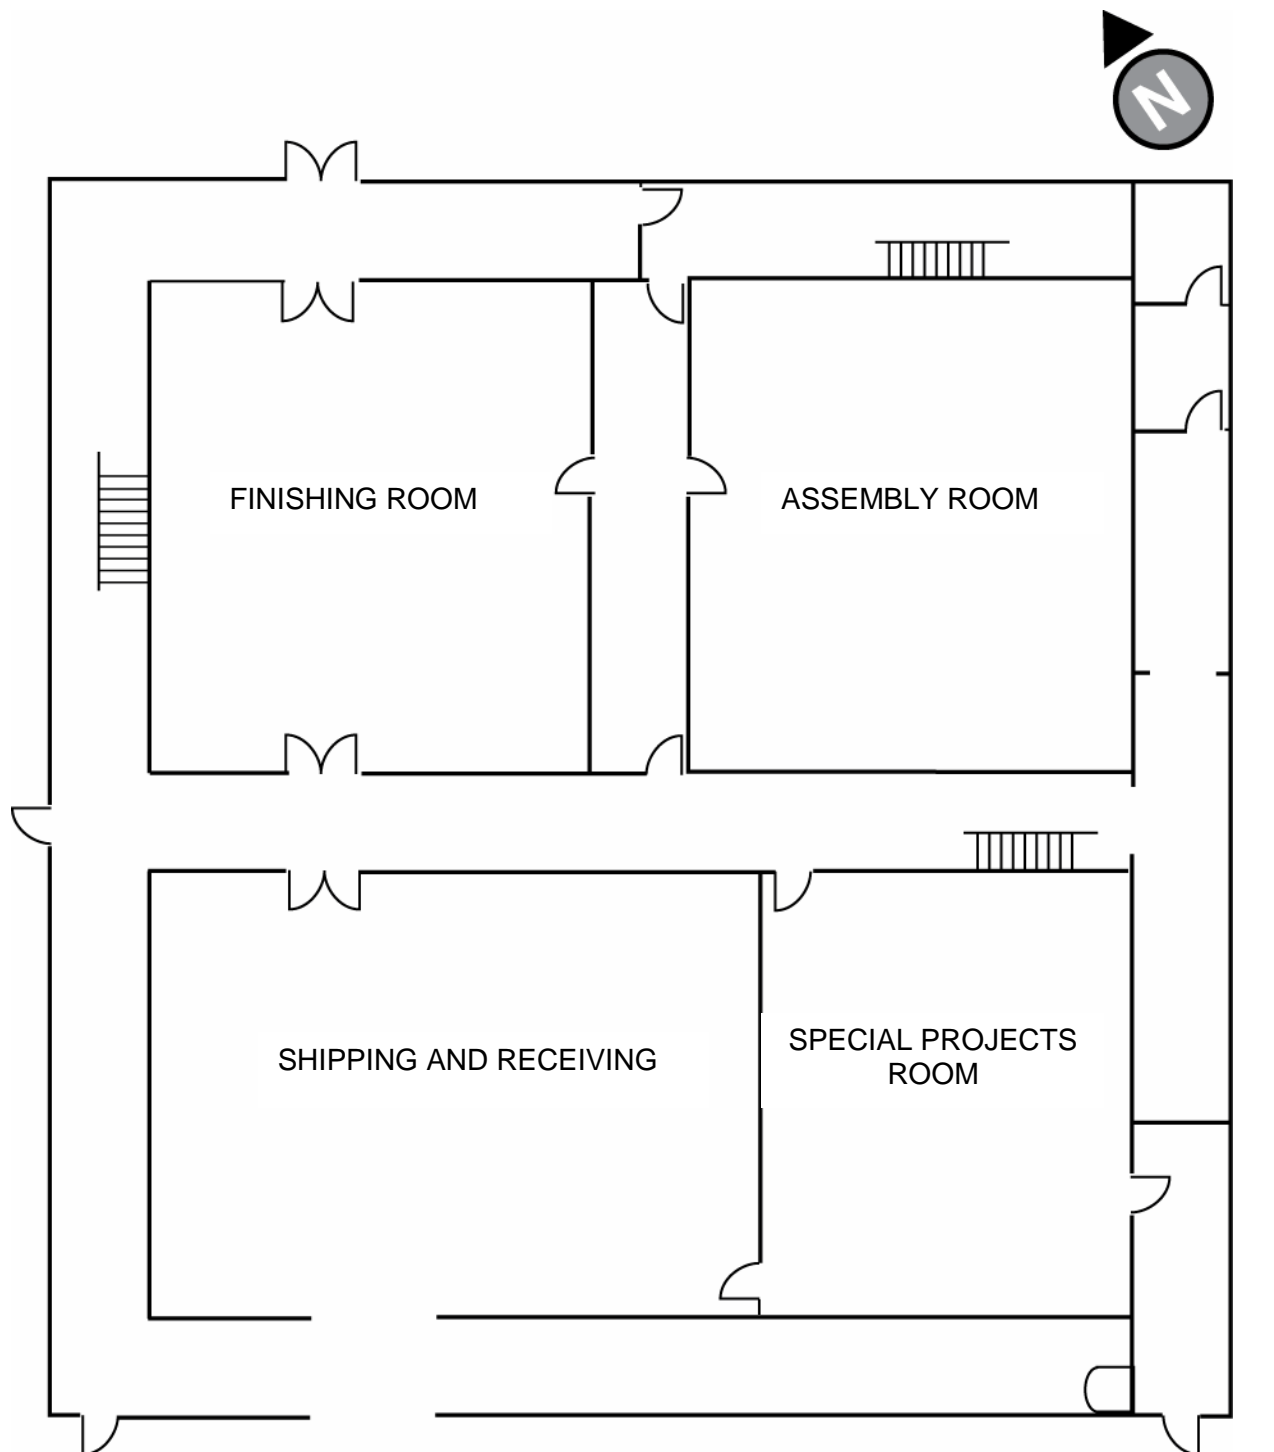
Floor Plan for Building 9825H, Special Projects Building, 1st Floor
